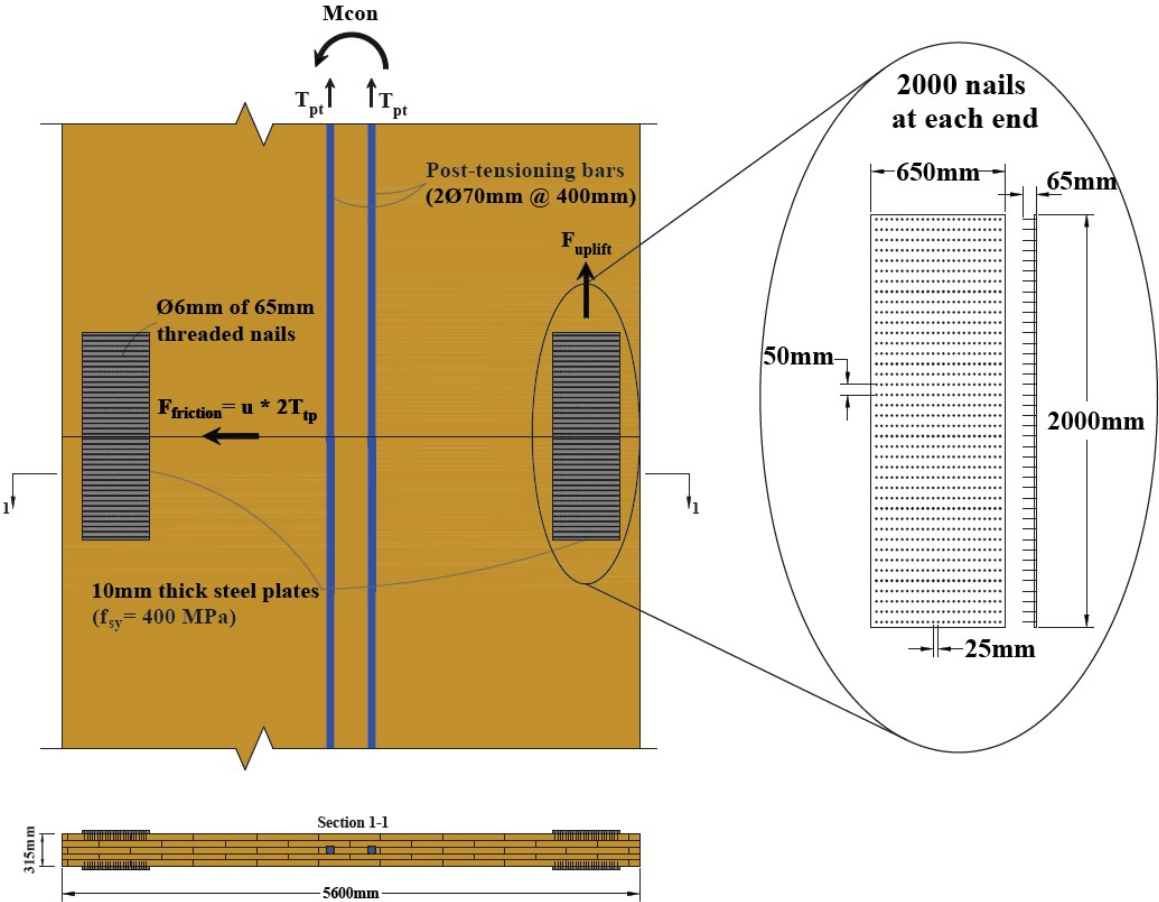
Rigid connection design for single rocking segment system of case study building 5
